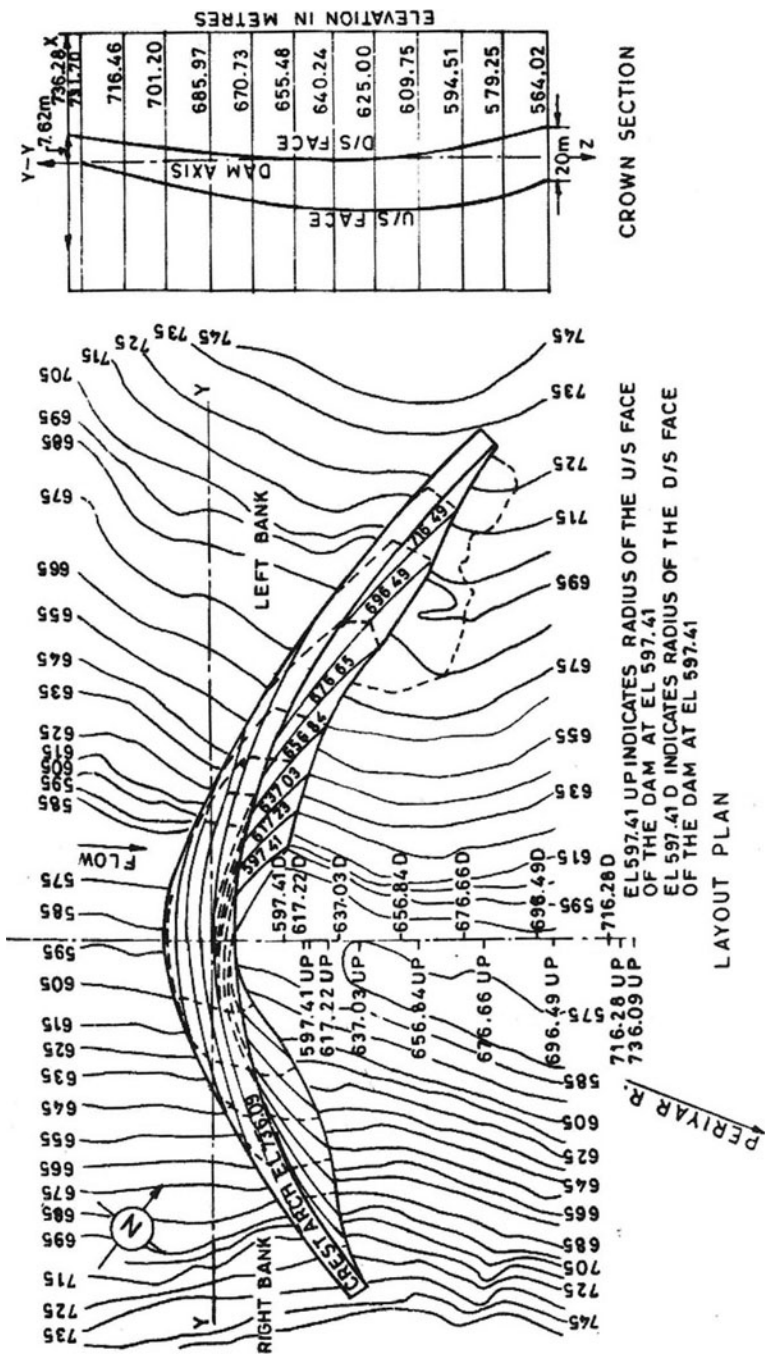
Idukki Dam: Layout plan and crown cantilever section. (Ref. H.D. Sharma)
